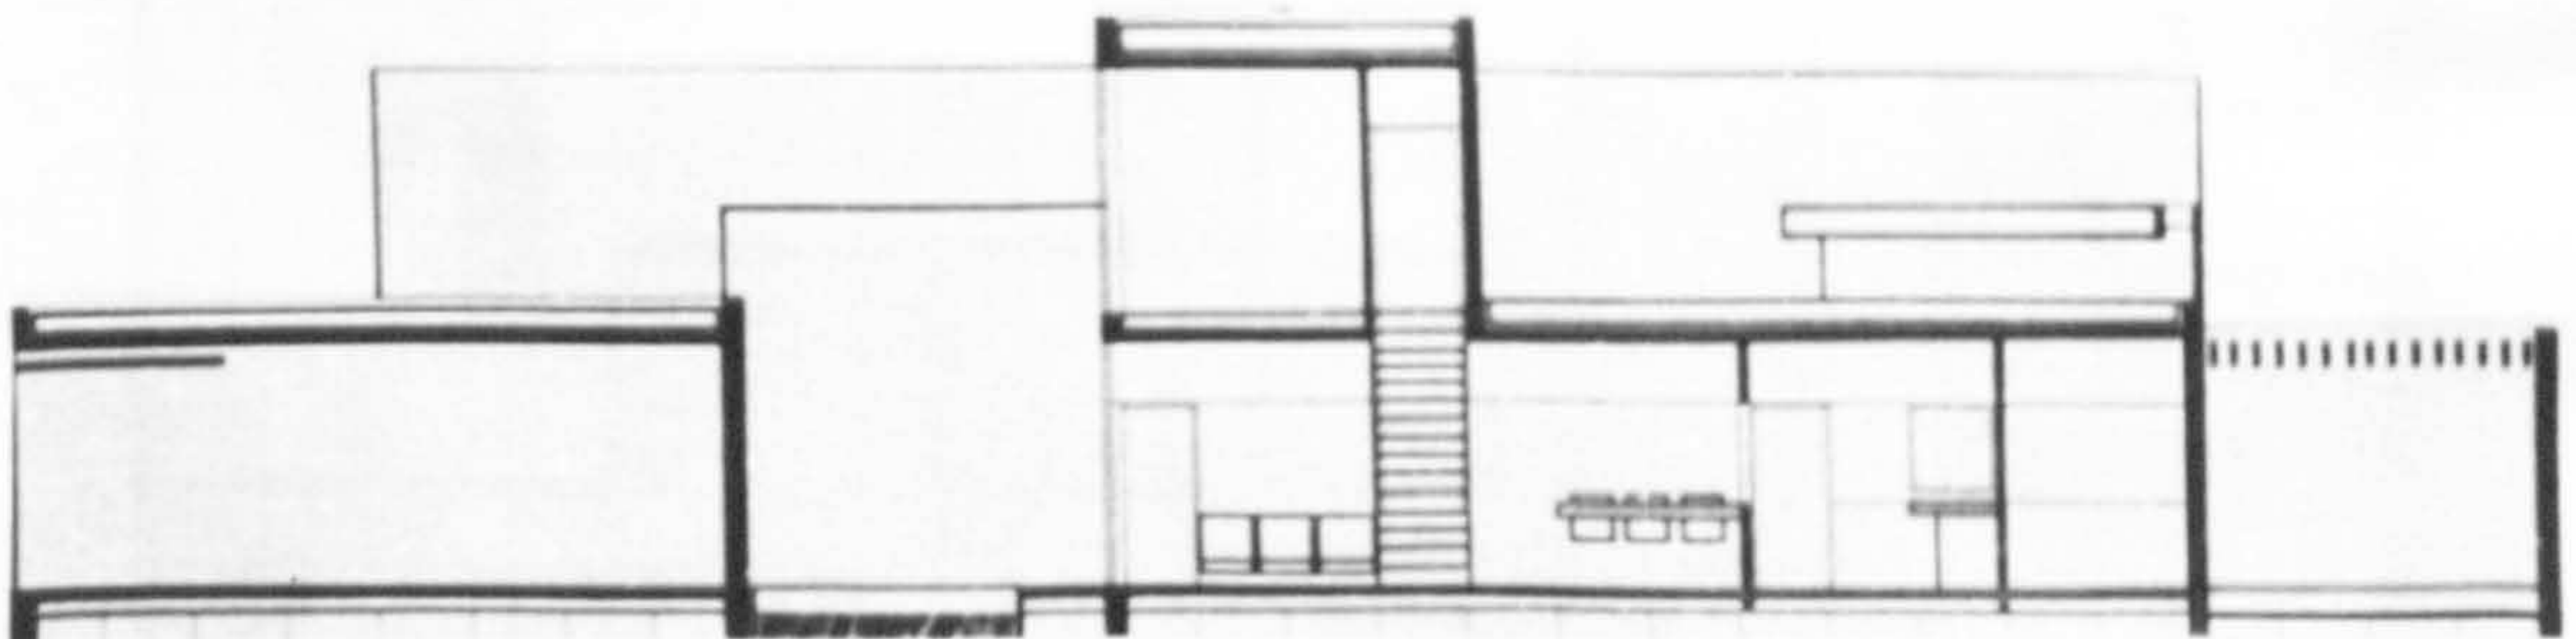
HOUSE TYPE (A) , PROPOSED
